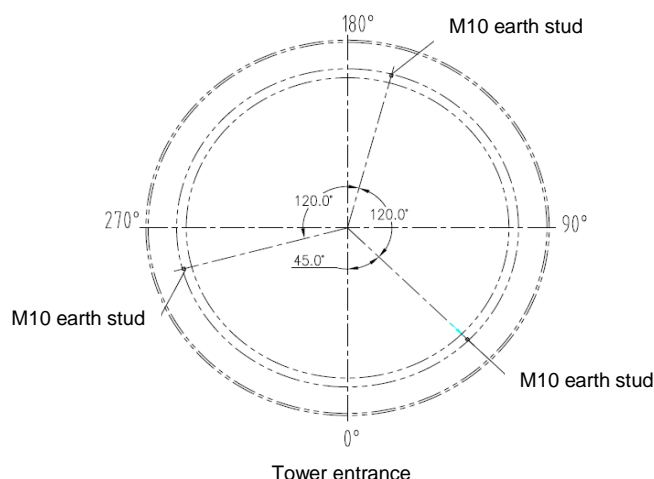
Positions of studs for equipotential bonding between steel tower sections
